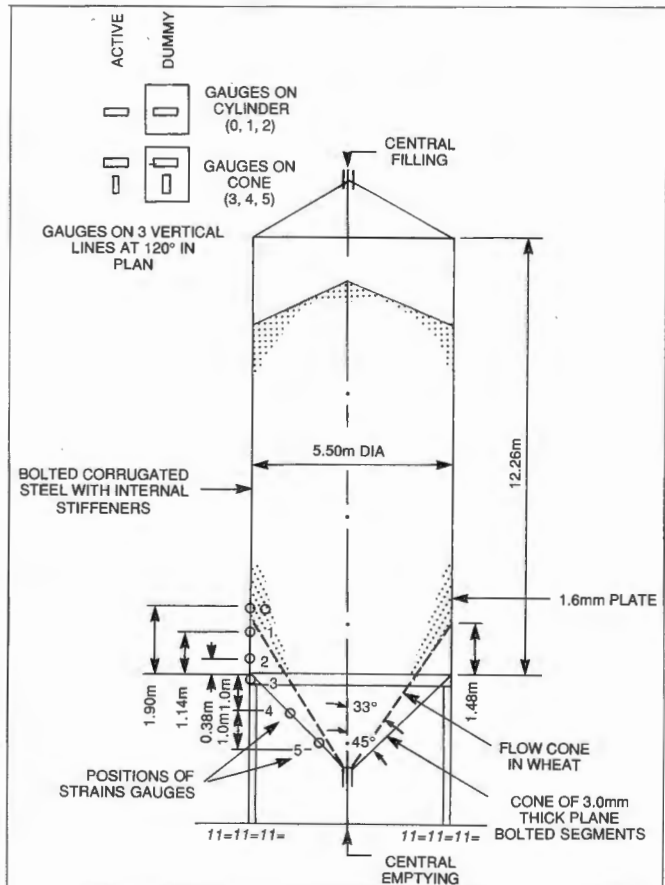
Main dimensions and layout of silo; layout of strain gauges in elevation
